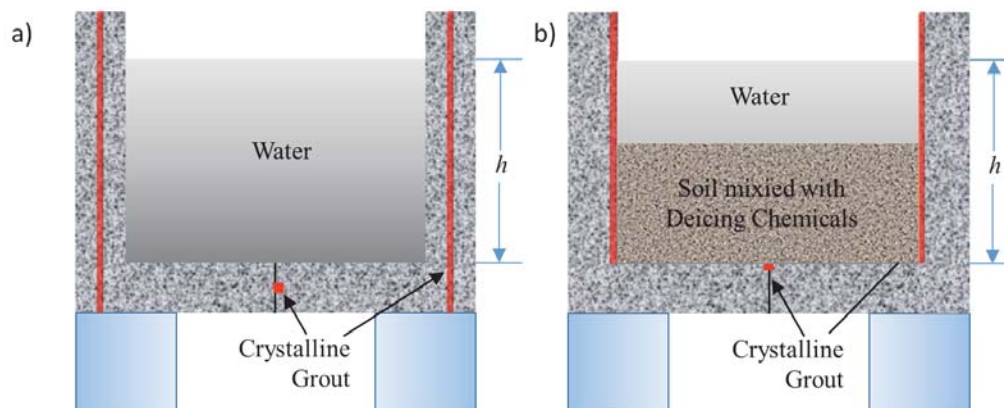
Designs for water tank tests: a) without backfill and b) with backfill.
